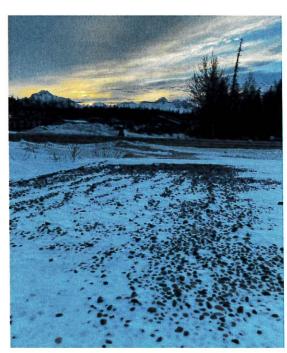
Looking south from approximate floor of the gravel pit towards Rays Child Care Center.
